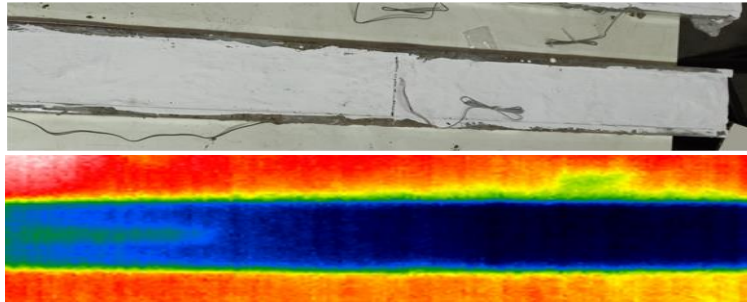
Specimen CB – GI – 2SC before testing (Mobile IR Camera).
